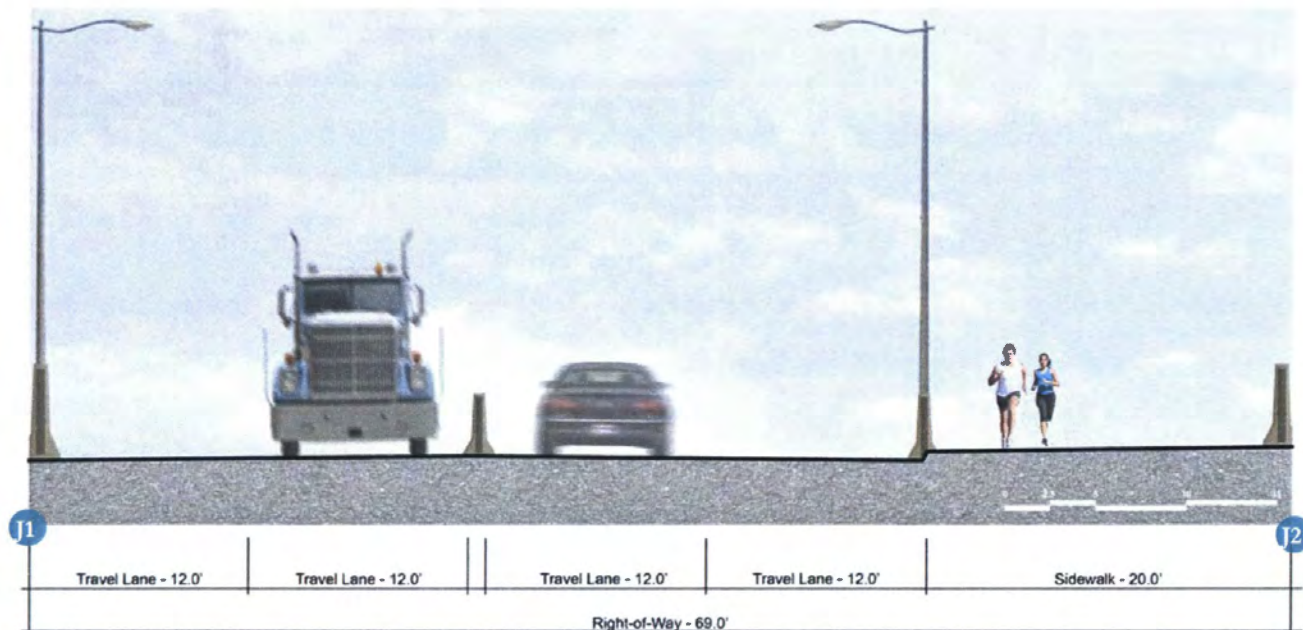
West 3rd Street between Summit and Al Lerner Way Zoomed-In Plan
